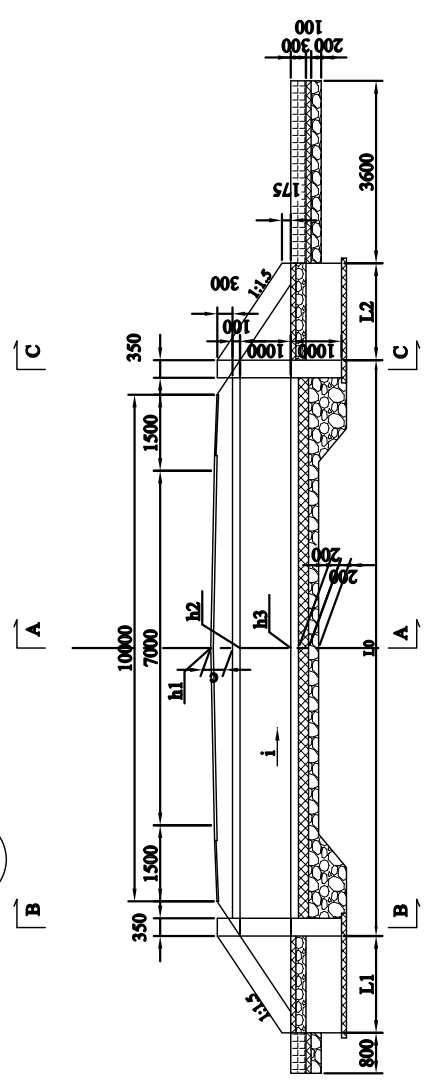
Construction Plan of Murun Bridge(3)
